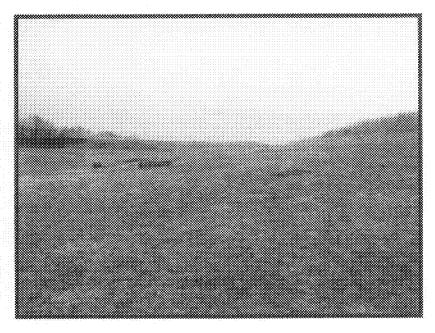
View of the southern portion of the haul road corridor, view facing north from approximately station 13+00.
